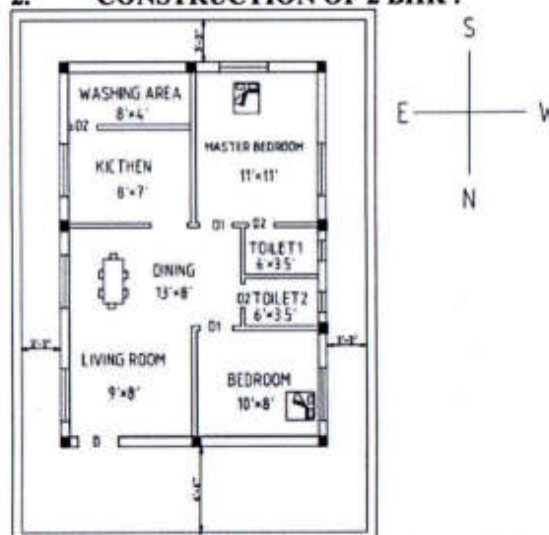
PLAN OF 2BHK BUILDING ESTIMATE
